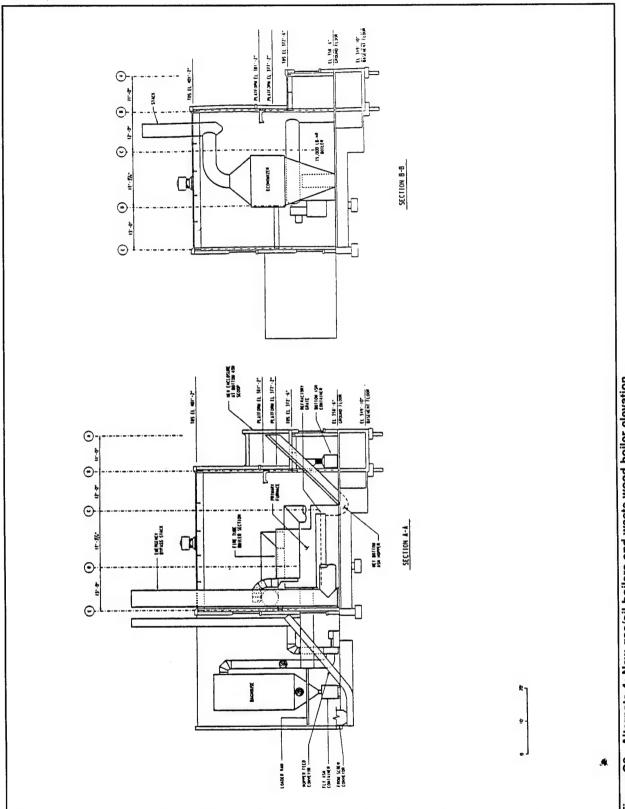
Alternate 4: New gas/oil boilers and waste wood boiler elevation.
